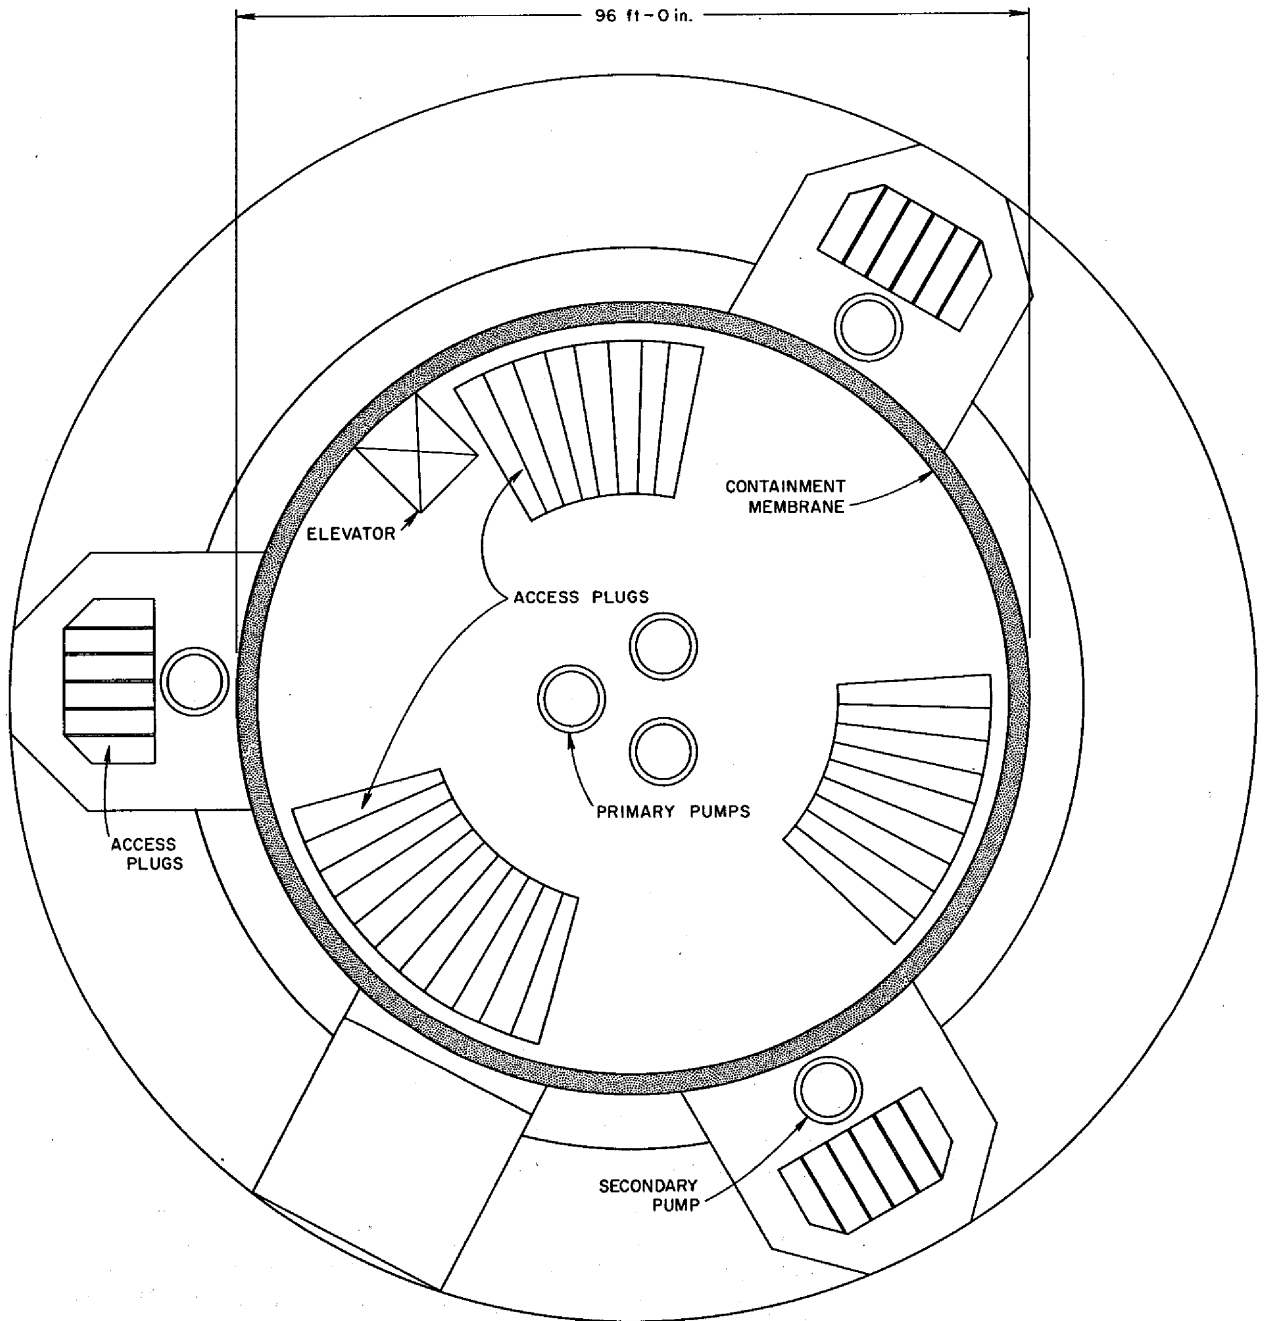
Plan View, Fifth (Operating) Floor of Confinement Building, Section EE.
